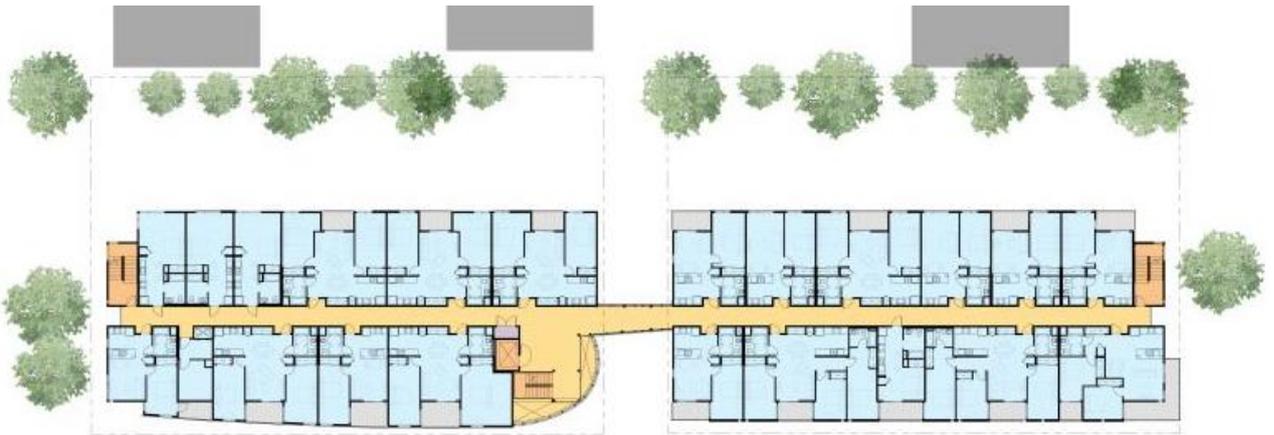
Upper Level Floor Plan (Source: <http://www.archdaily.com>, Accessed 05 August 2017)
